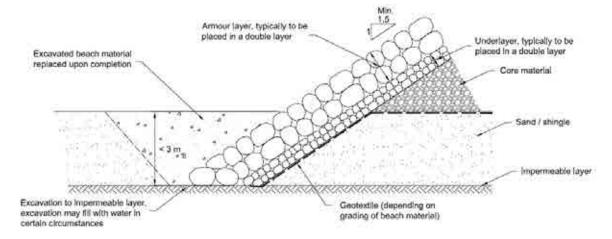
Cross-section of a Typical Rock Revetment Seawall (Source: CIRIA, 2007)
